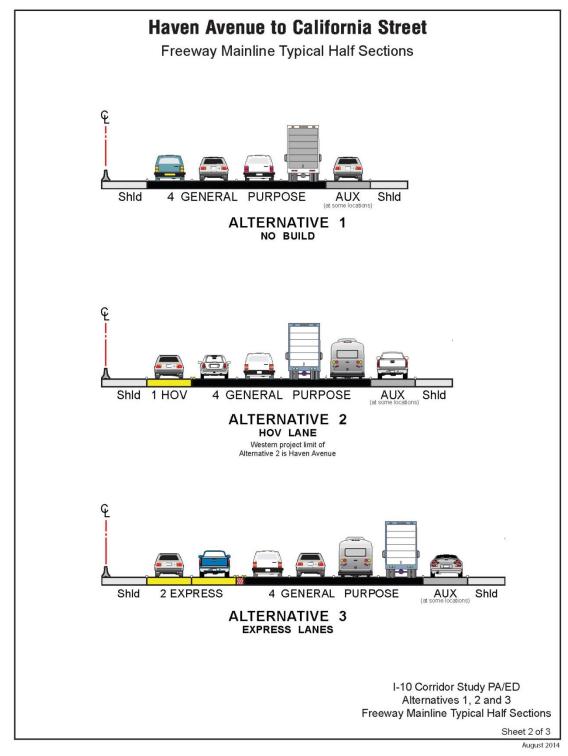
Alternatives 1, 2, and 3 Typical Half Sections (Page 2 of 3)
